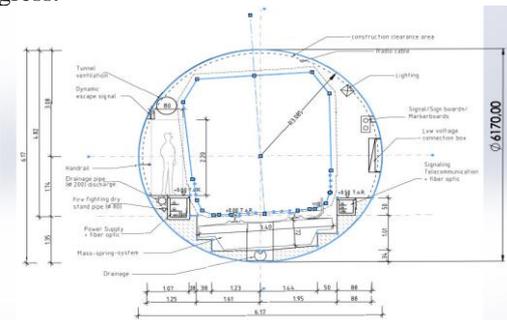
The technical drawing and the projection details of the pilot line [3].
